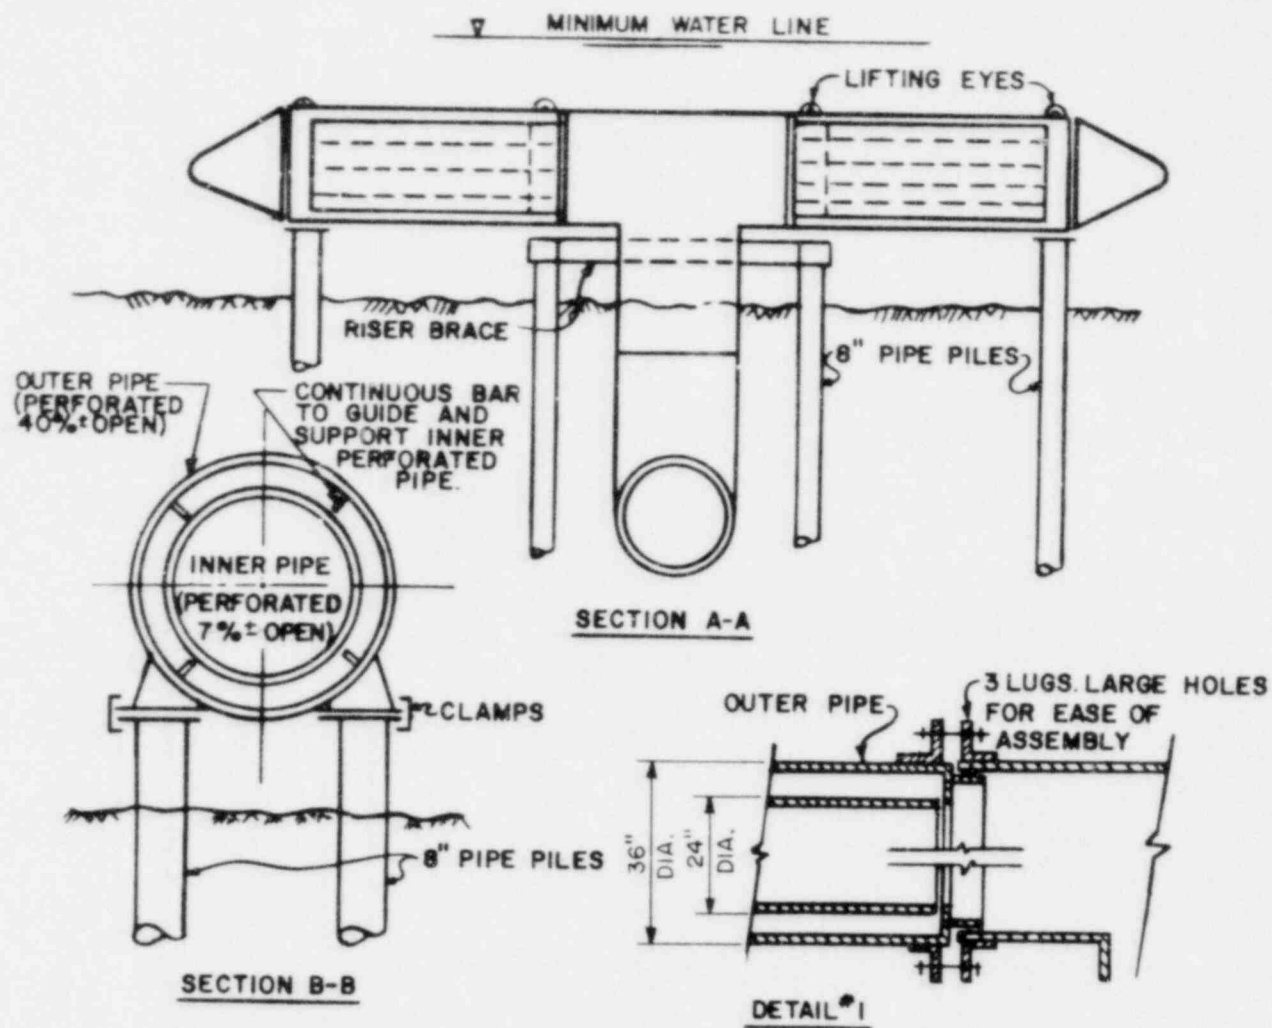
PERFORATED PIPE SUPPORTING FRAMEWORK
